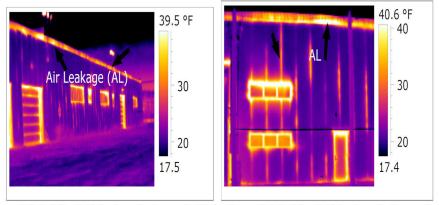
Building 3 Air Leakage Pathways @+25Pa Image 9-4. Building 3 Air Leakage Pathways @+25Pa
